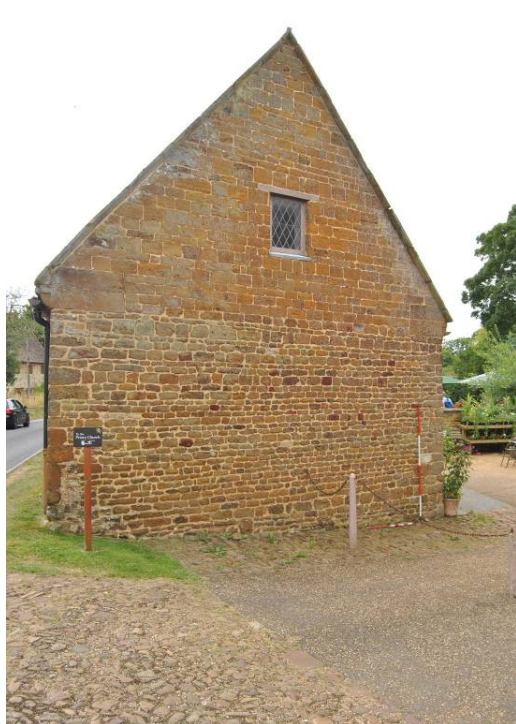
Northern, angled gable end, note rebuild above eaves level.
